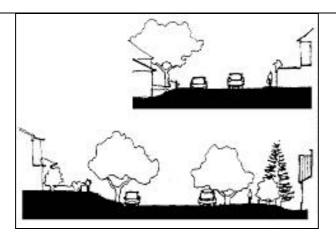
Two examples of typical sections of South Bronte streets with variation in width and building setback.
